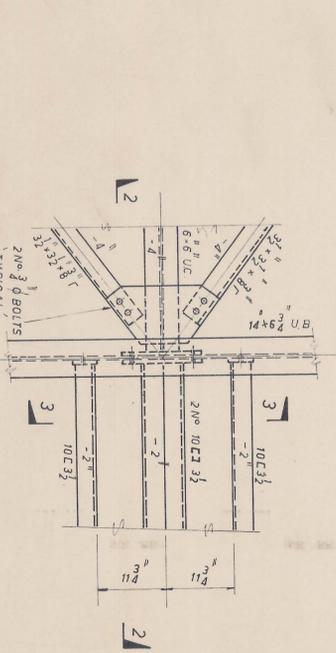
6 3/4 U.B. TO MAIN FRAME
